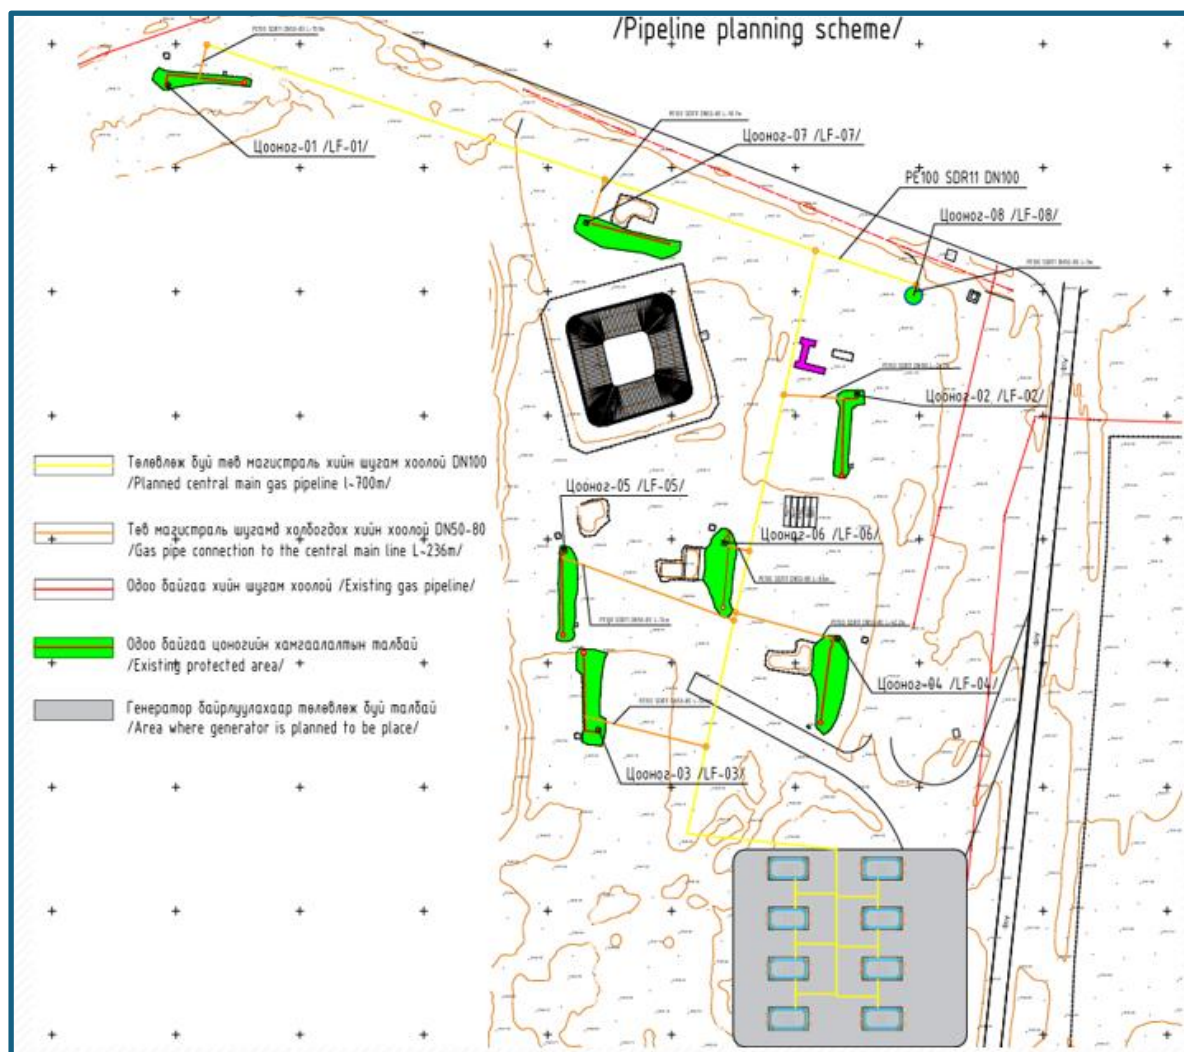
Preliminary plan for the Gas to Power Project at the Pilot Well Project site.
